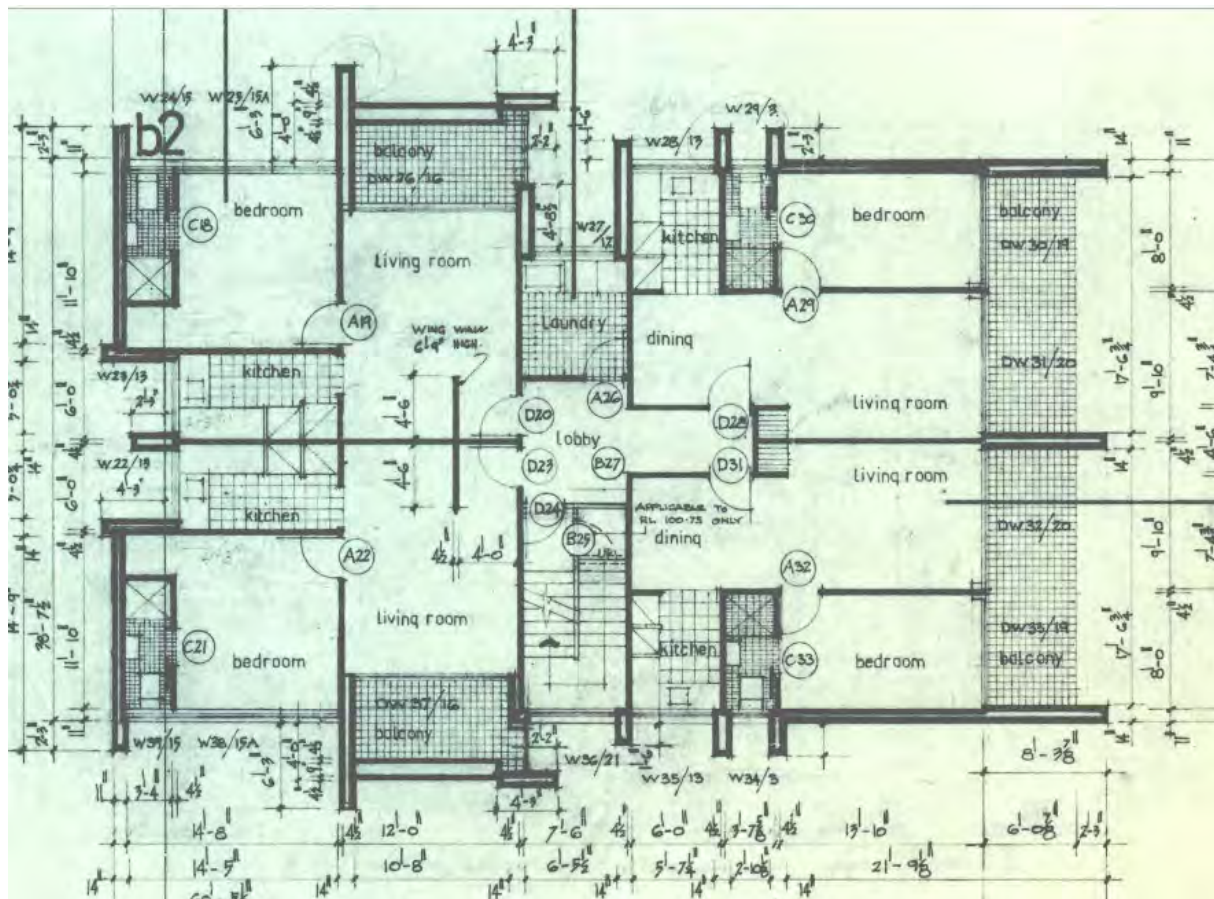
Submitted architectural drawings, 21C Billyard Avenue typical floor plan (detail), 1972 showing the one bedroom apartments. The expression of the brick fin walls in the plan is notable, along with the careful articulation of balcony spaces with privacy screens and planters. (Source: City of Sydney Archives, A-00590018)
